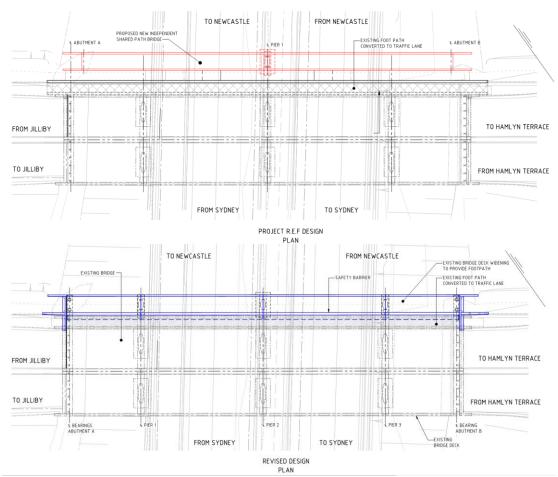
Comparison of Sparks Road overbridge between the original Project REF (above) and the Proposal (below)
